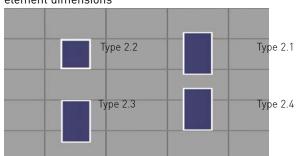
TYPE 2 - installation of frames outside element dimensions
